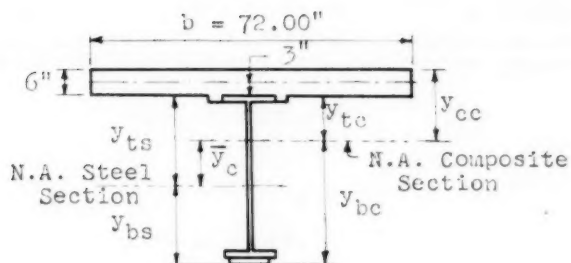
BEAM SECTION FOR EXAMPLE No. 1
